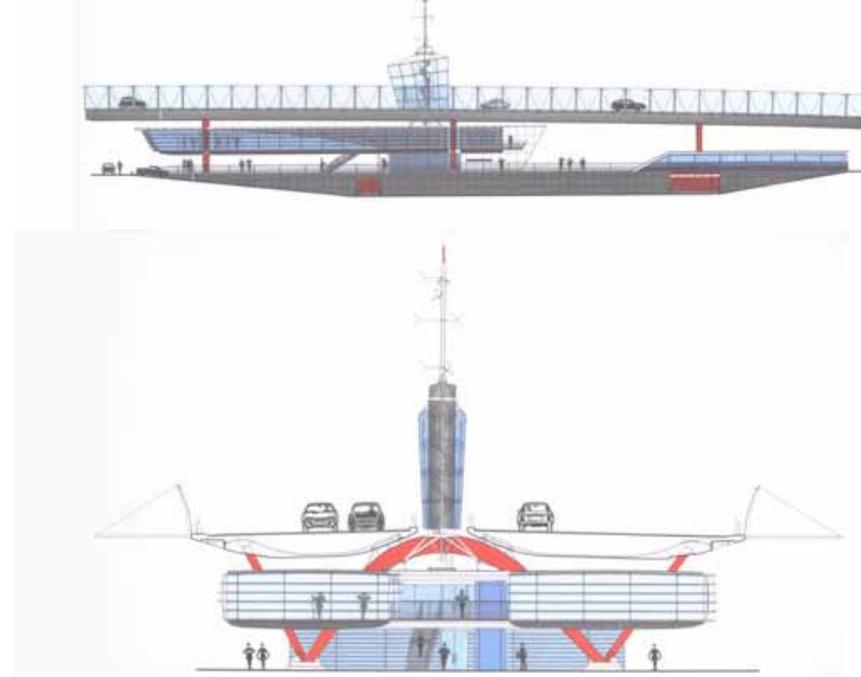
Motorway Bridge and Control Centre Elevations
